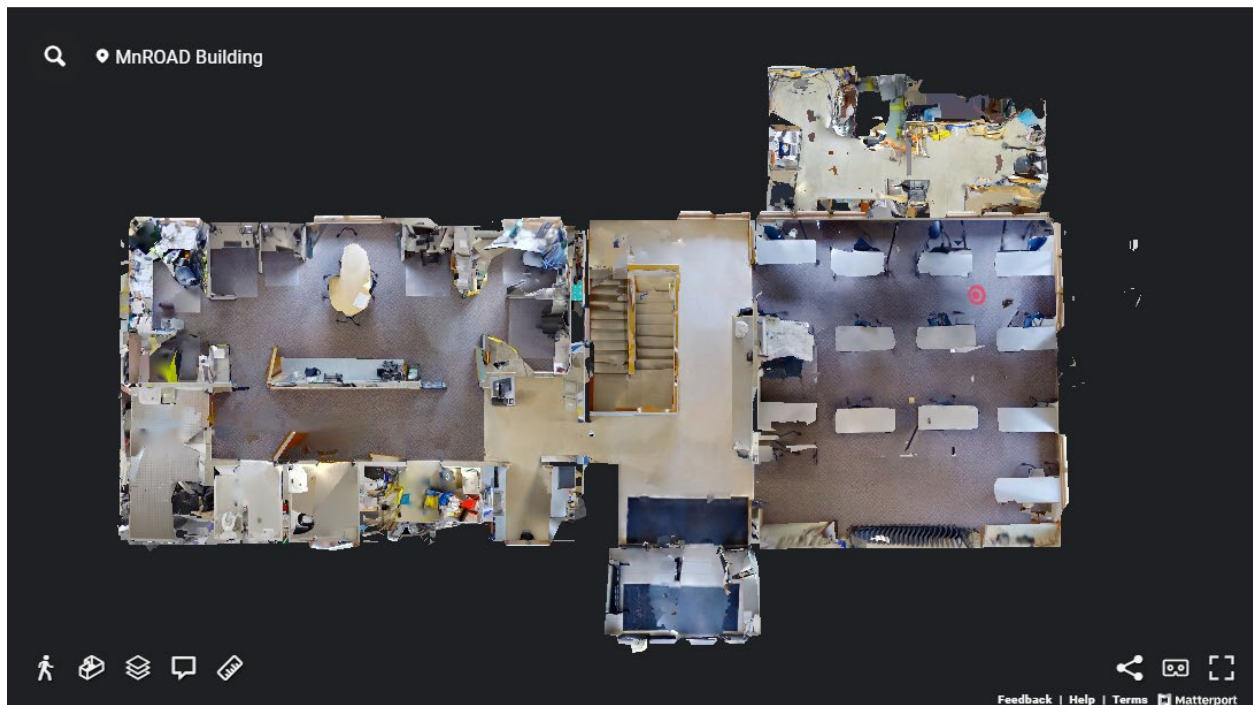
Matterport Plan View of MnROAD Building Interior
